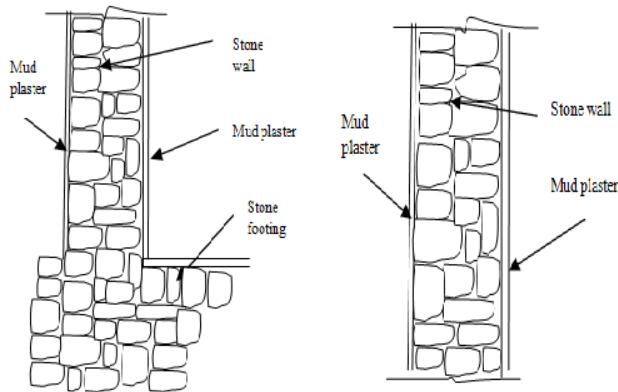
Typical stone masonry foundation (left) and stone wall (right)
